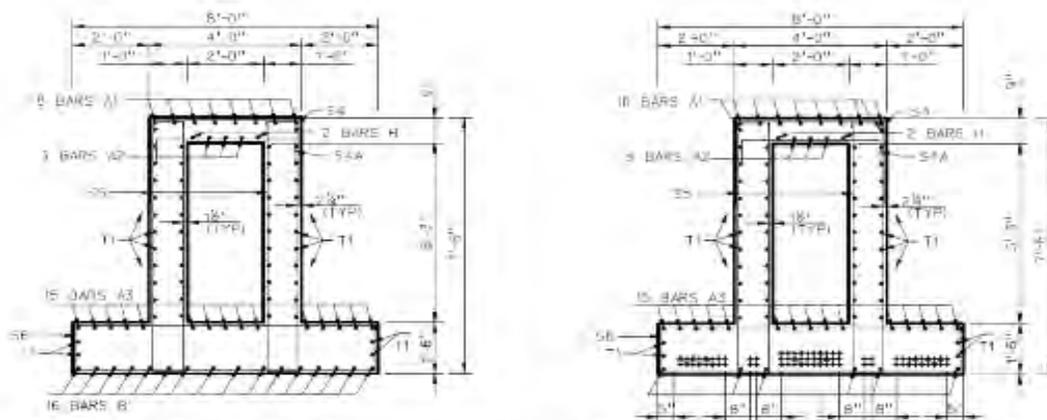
Inverted-T typical section (Precast with reinforced steel only, and precast with prestressed tendons)
